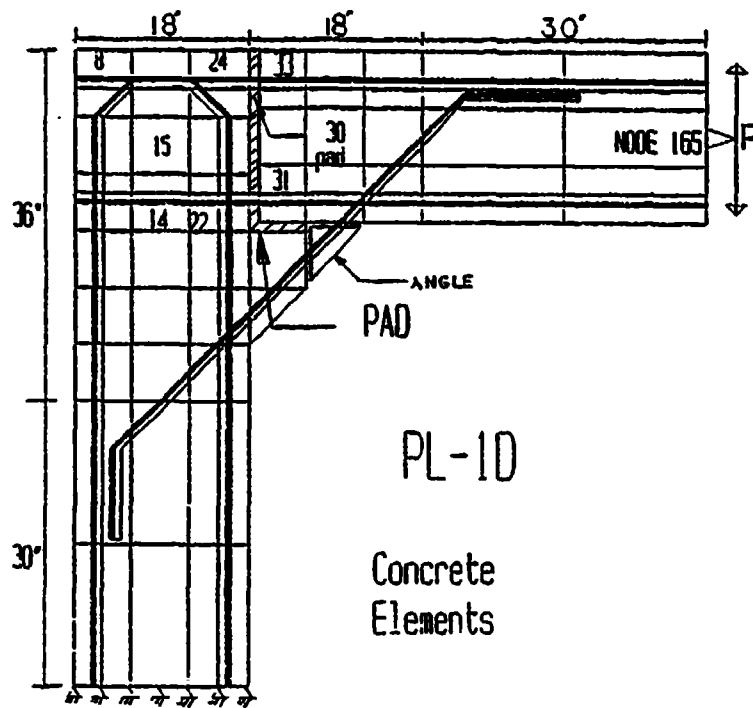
Connection detail PL-1D with labeled concrete and steel reinforcement elements.
